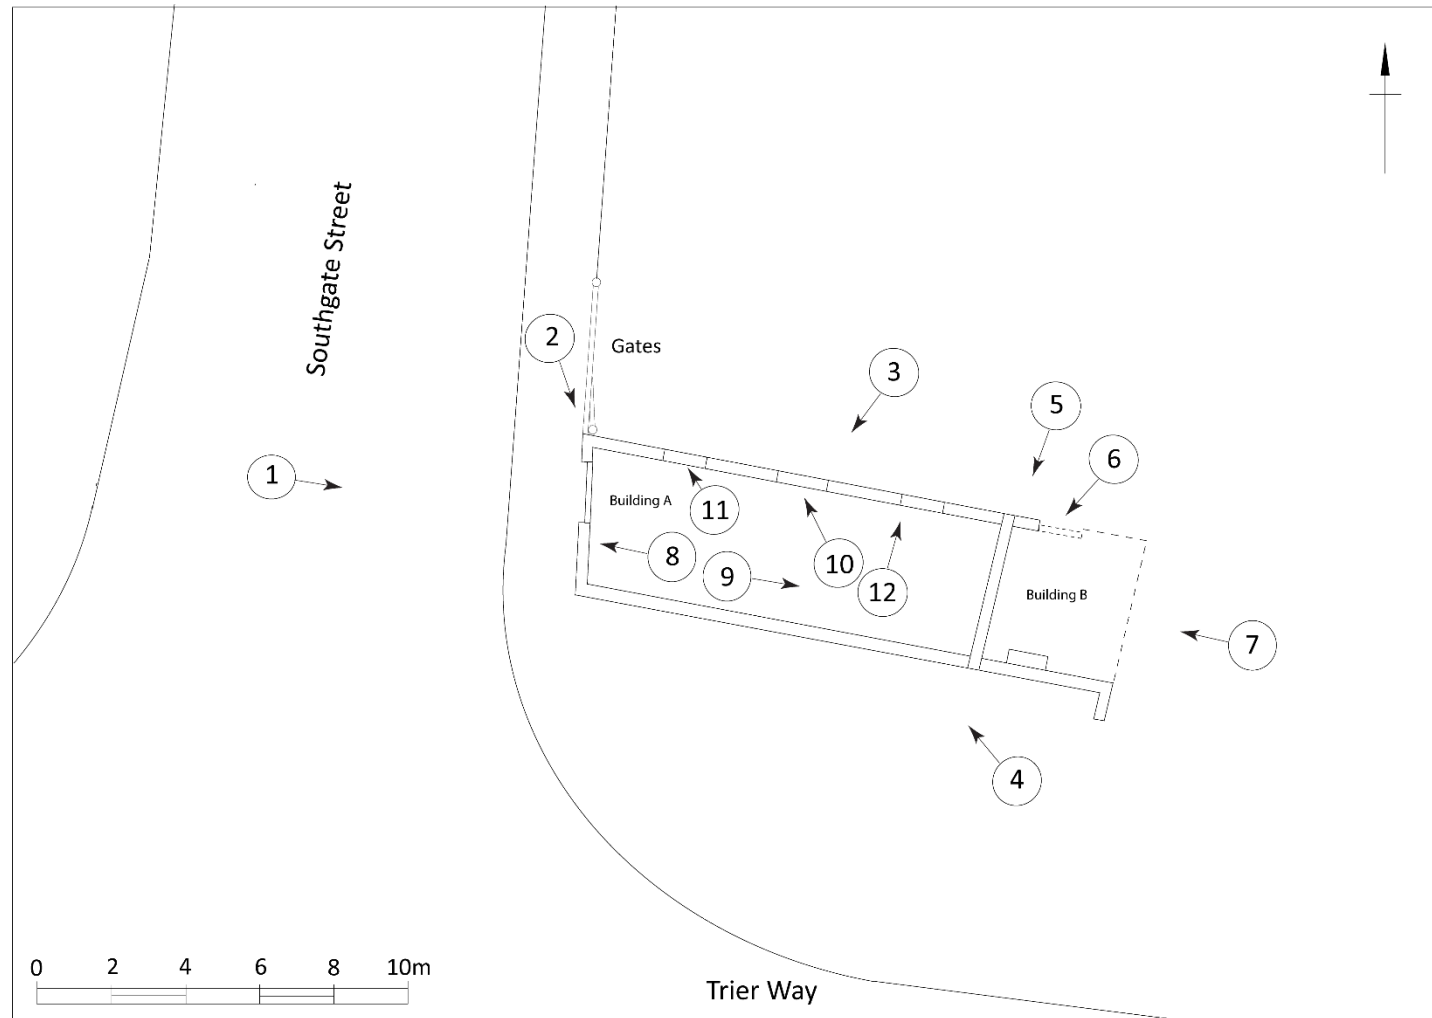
Annotated plan of former substation building and attached ruined structure at No. 169 Southgate Street Gloucester
